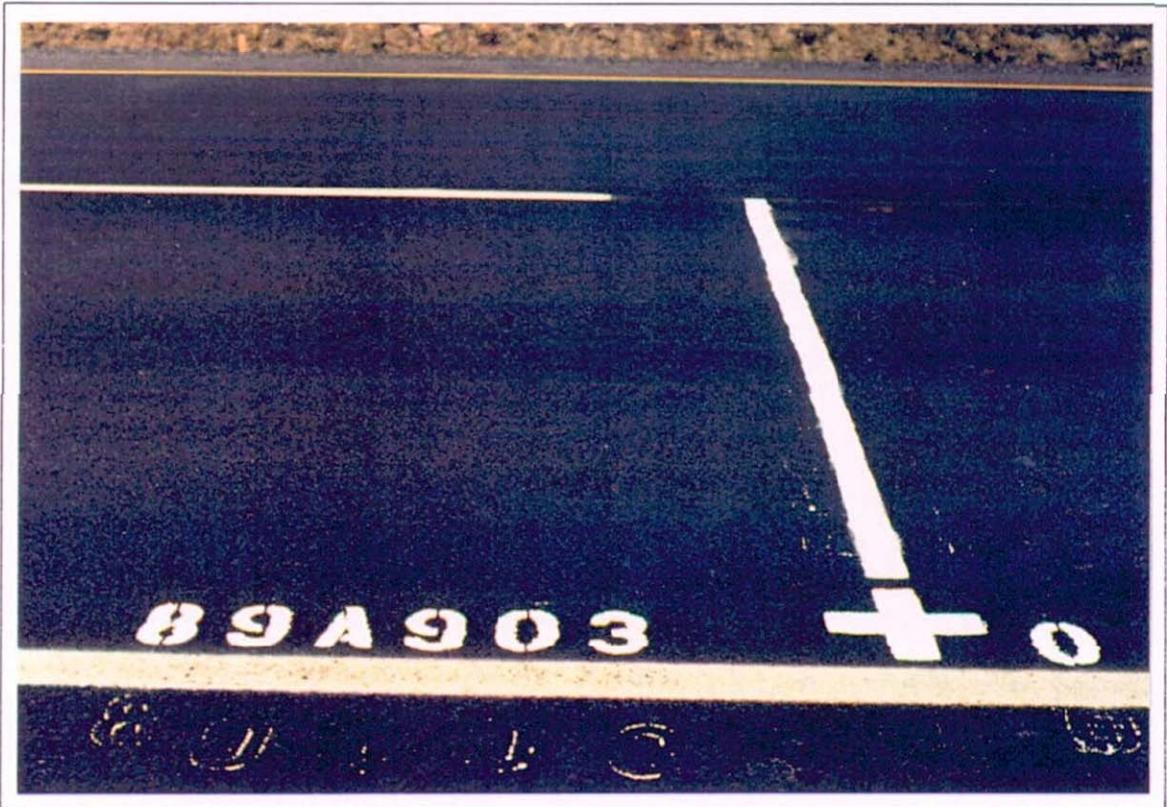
Pavement markings at station 0+00 of section 89A903 on the east bound overlay project.
